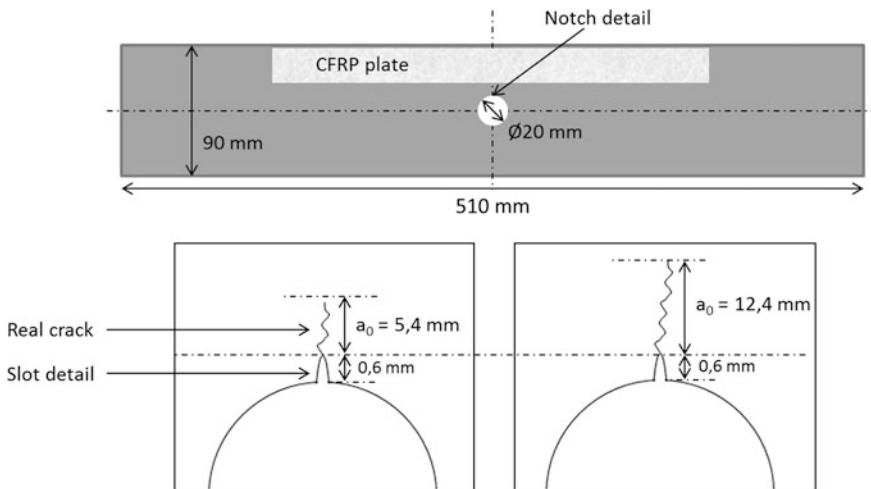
Configuration of CFRP plates reinforcement for cracked steel plates with center hole (not to scale): plan view
